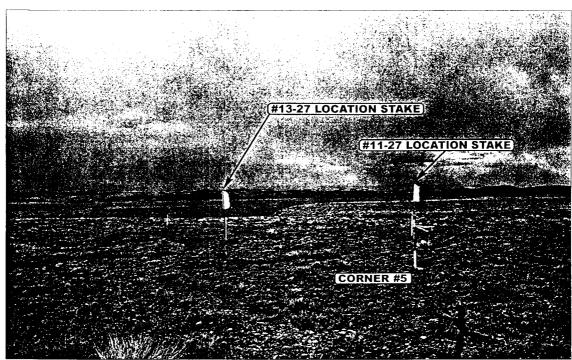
PHOTO: VIEW FROM CORNER #5 TO LOCATION STAKE
